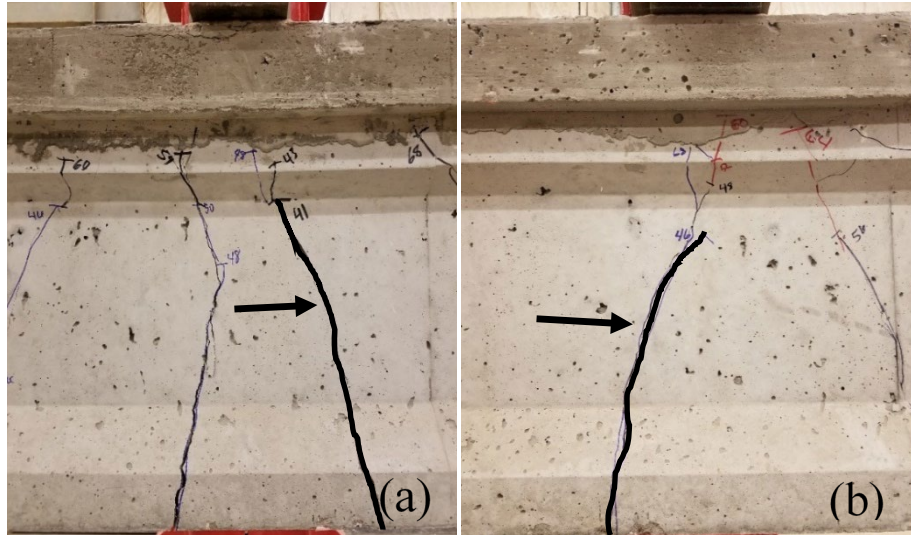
Initial flexural cracking under the load point on the NC3-N girder at 41 kips of load (a) and initial flexural cracking under the load point on the NC3-S girder at 46 kips of load (b). Arrows point to the dark lines that indicate the initial flexural cracks.
